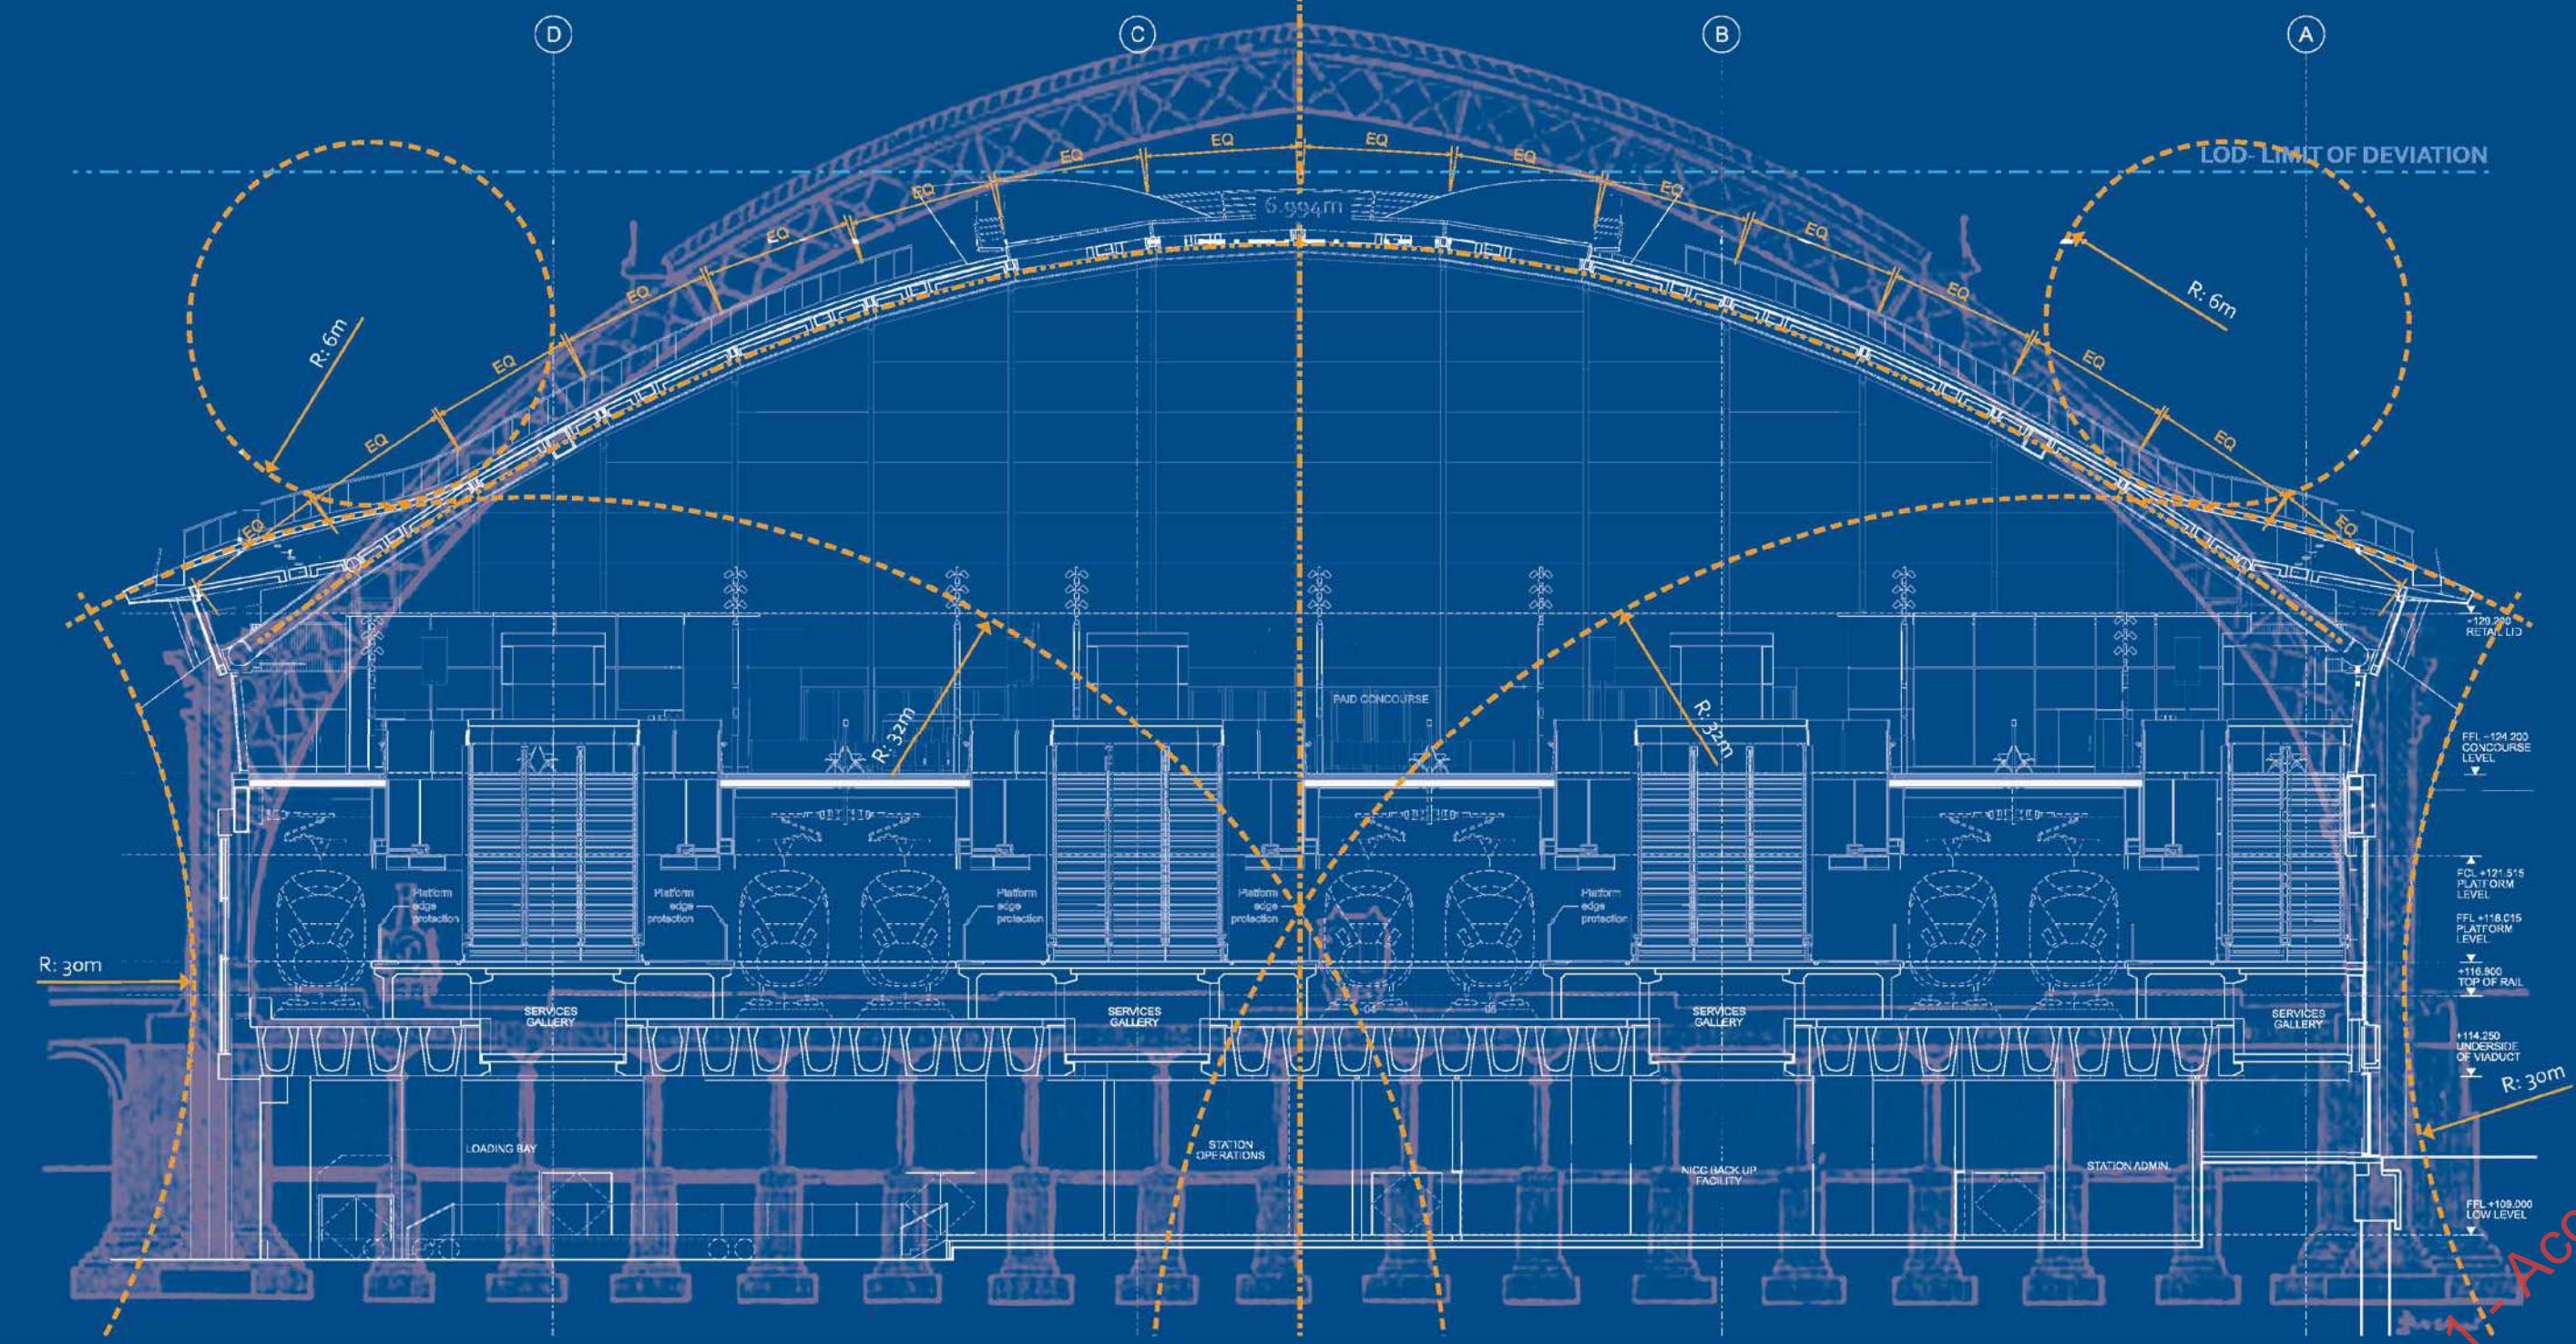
Short section of Birmingham Curzon Station superimposed with that of St Pancras Station. St Pancras station's Gothic pointed arch roof canopy has a similar span to Birmingham Curzon's parabolic arch.
